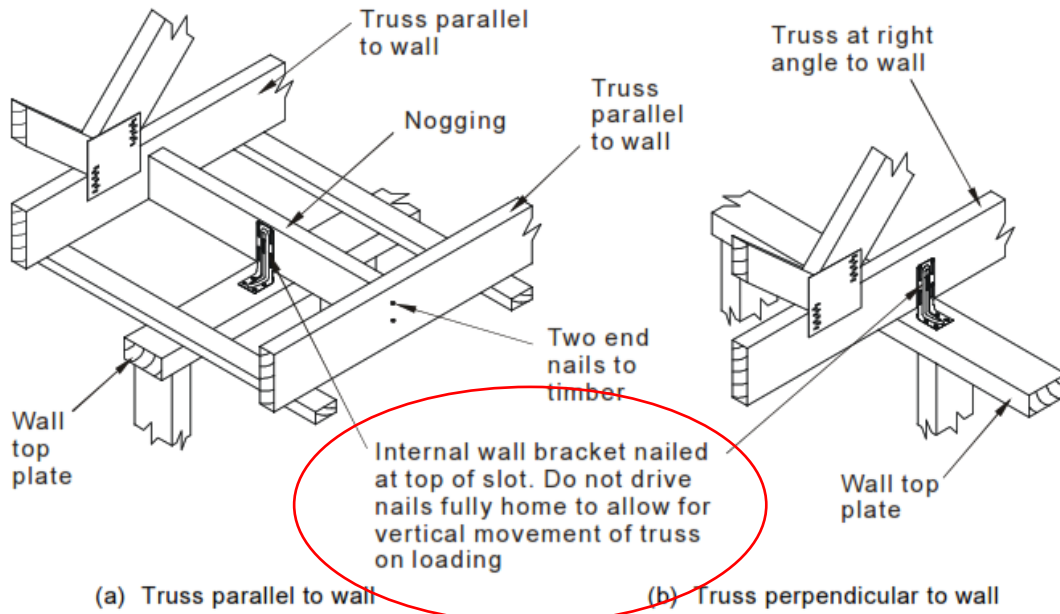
FIXING OF TRUSSES TO FREESTANDING NON-LOADBEARING WALL THAT IS NOT A BRACING WALL
